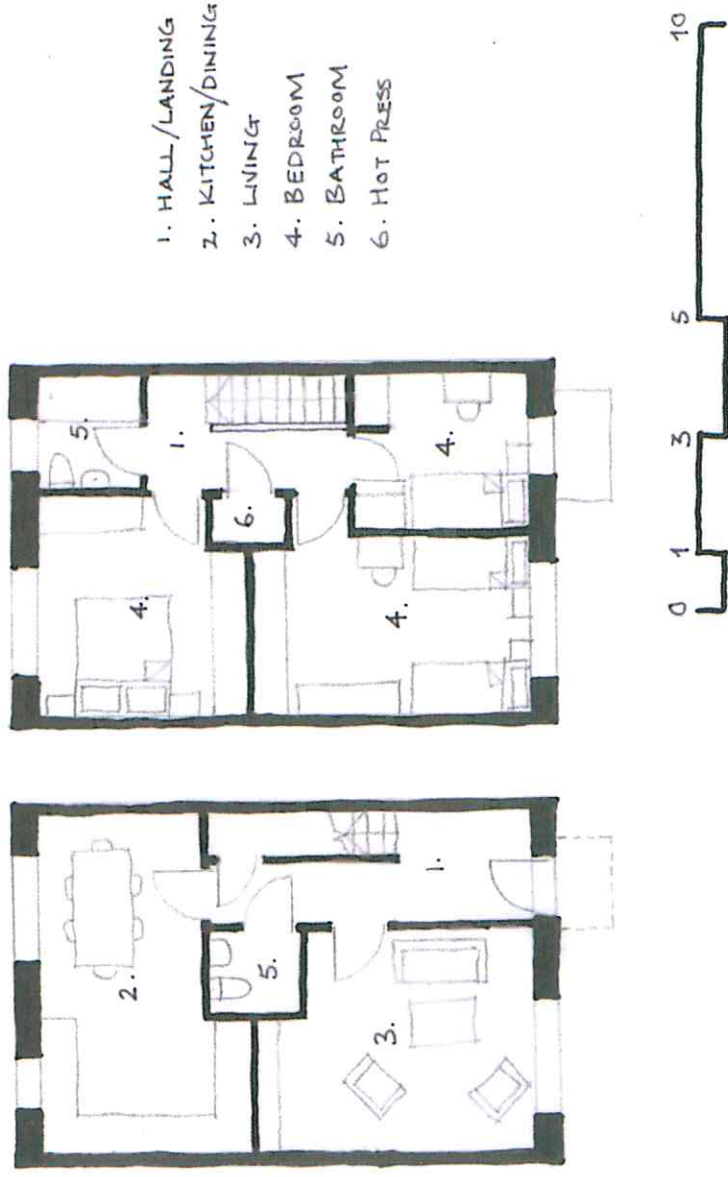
Sketch Plan for Three Bedroom, Five Person House (Two Storey).
